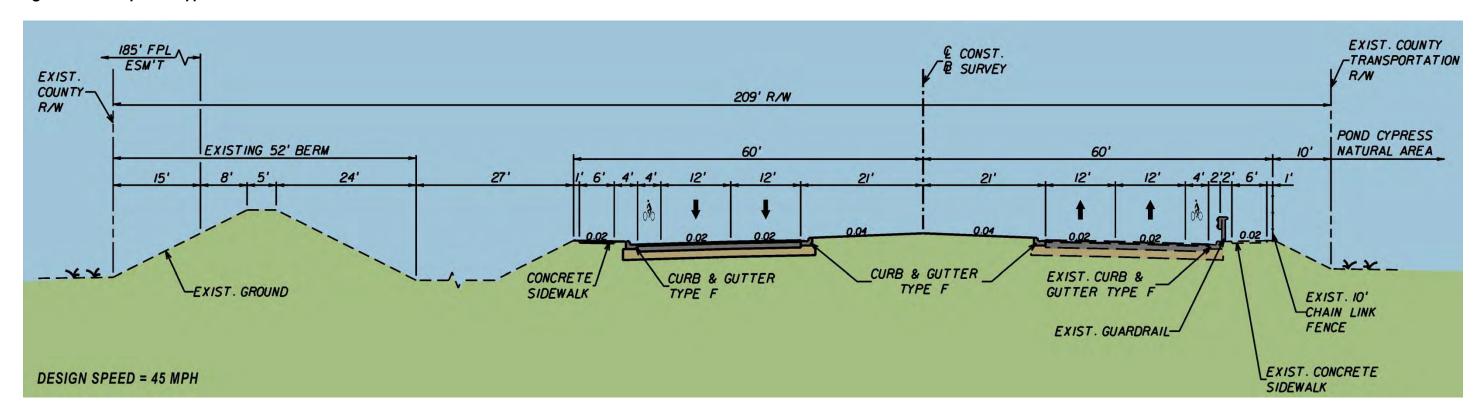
Existing Typical Section-Parallel to the Acreage
